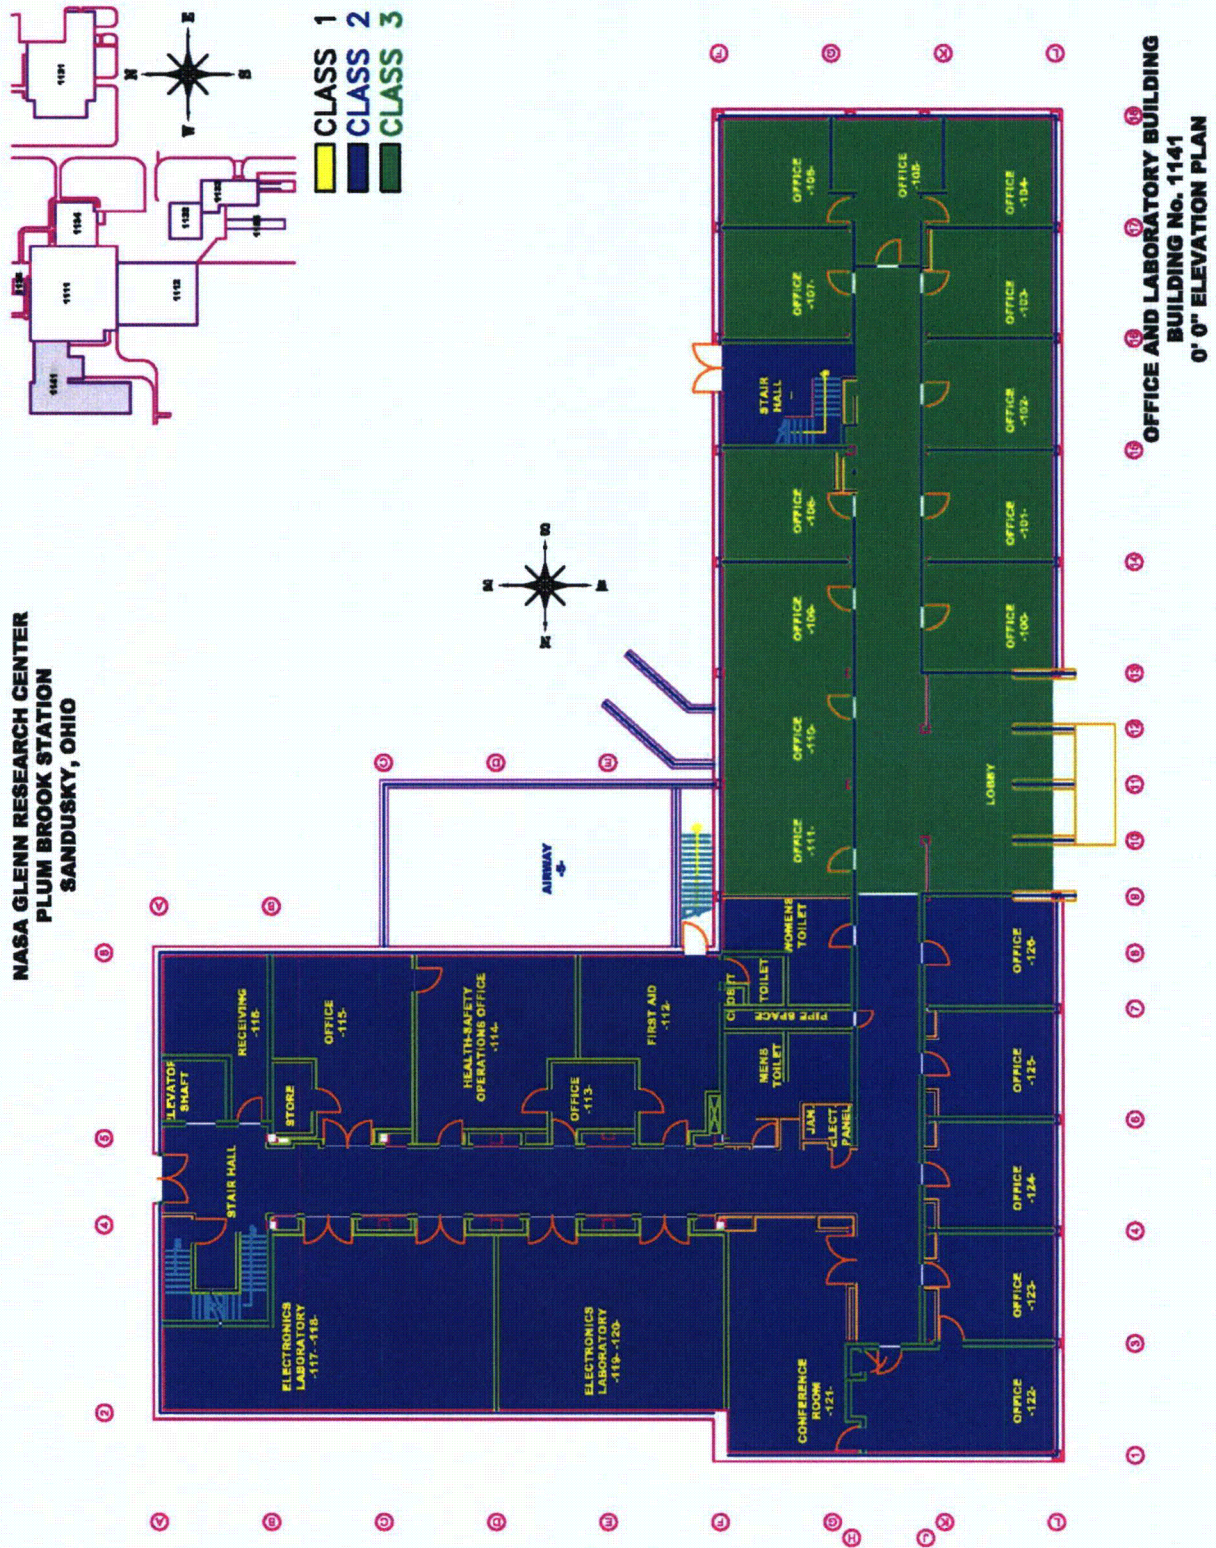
Reactor Office and Laboratory Building 1st Floor Elevation
